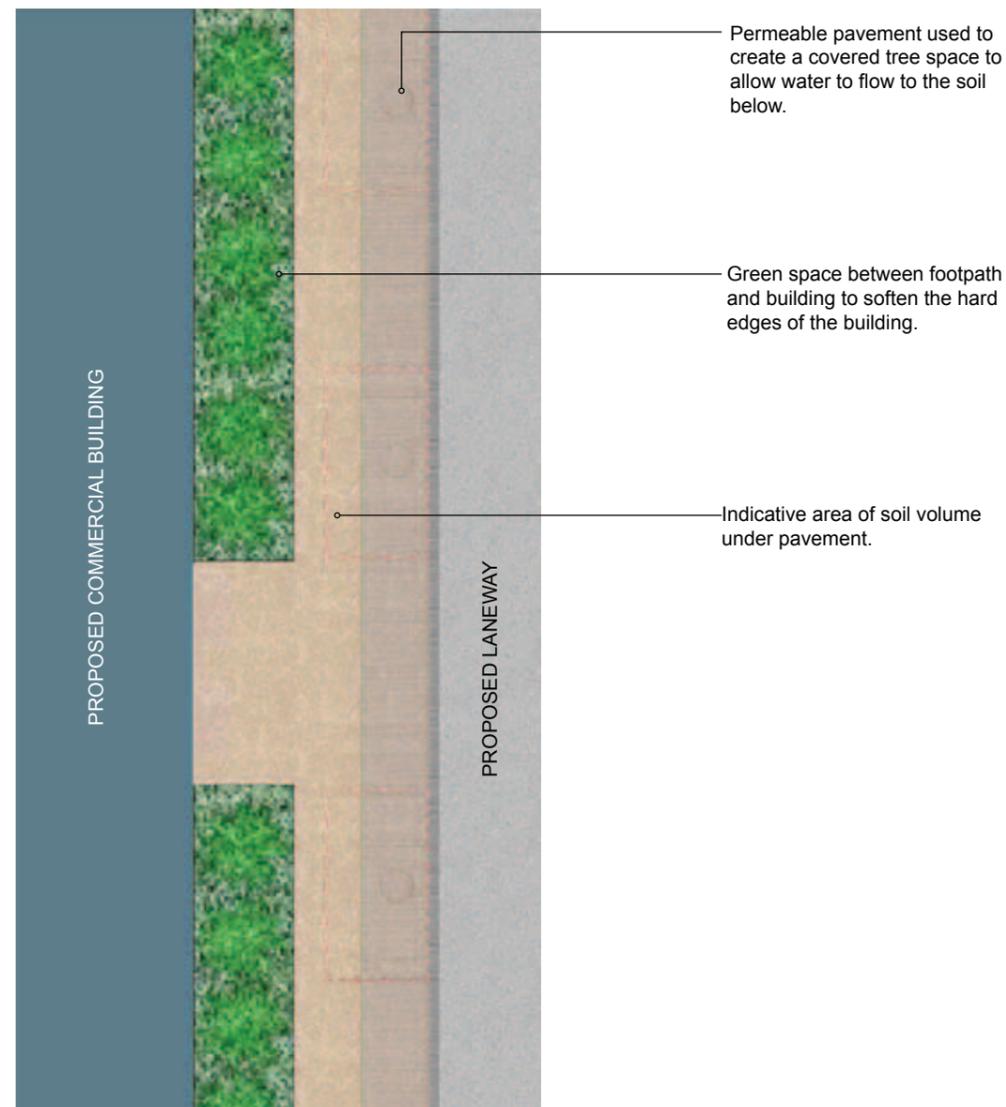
TYPICAL FOOTPATH DETAIL - SHARED LANEWAYS
